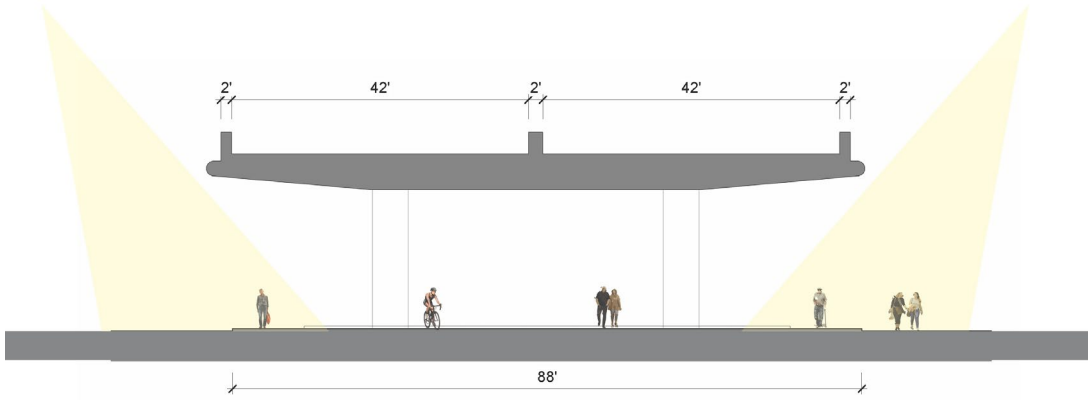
, Underpass - Section - EW – Russel Street (Source: Drawn by Author)
